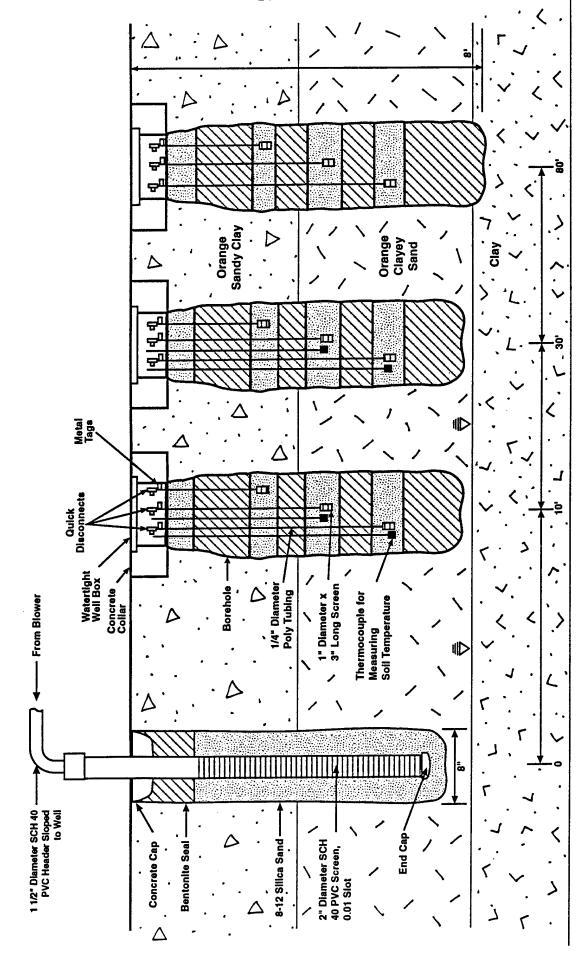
Cross Section of Vent Well and Monitoring Points at Site SS-10 Showing Site Lithology and Construction Detail (not to scale)
